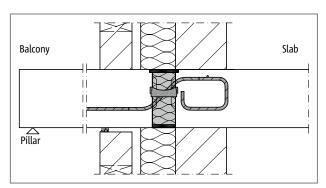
Schöck Isokorb® T type Q-E-W-V: Connection for core insulation
